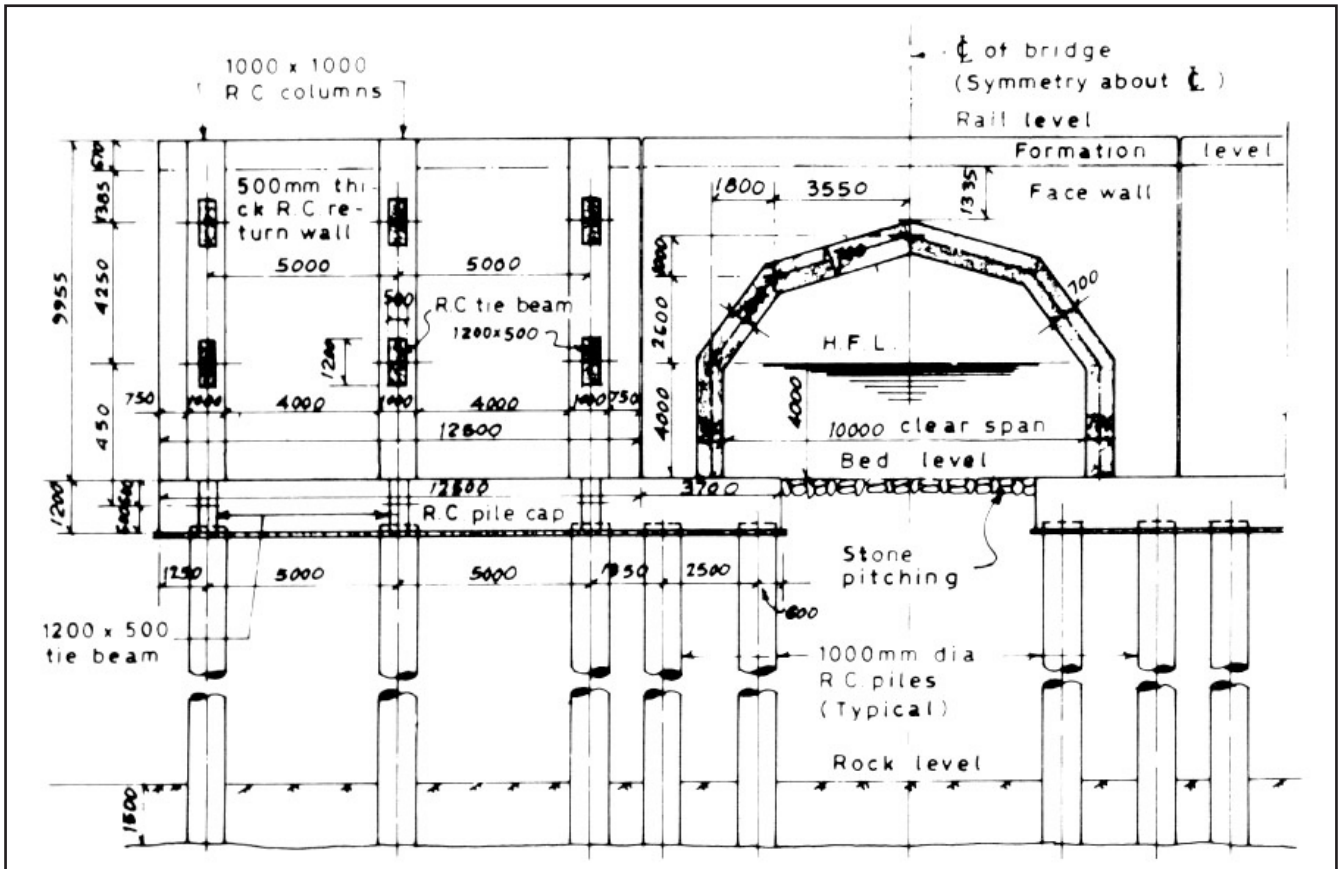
Longitudinal section of a funicular culvert on pile foundations
